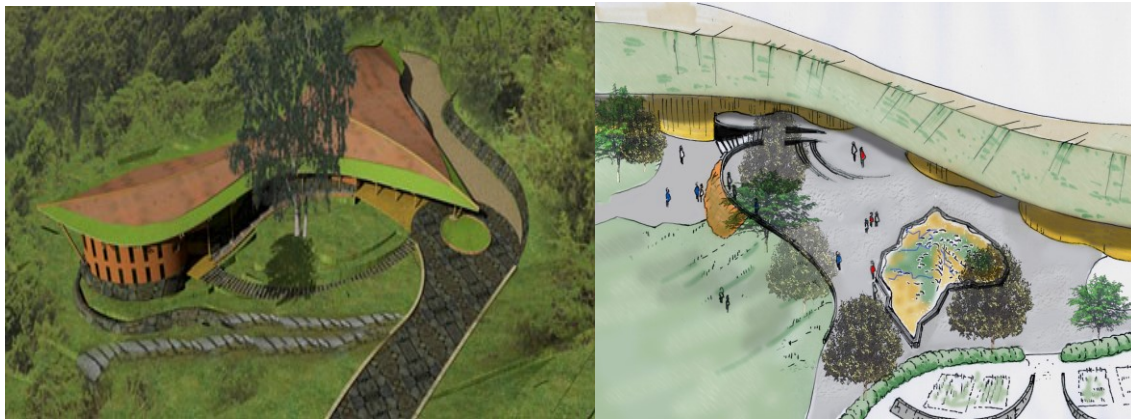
Gulele Botanic Garden Center Extensive green roof design.
